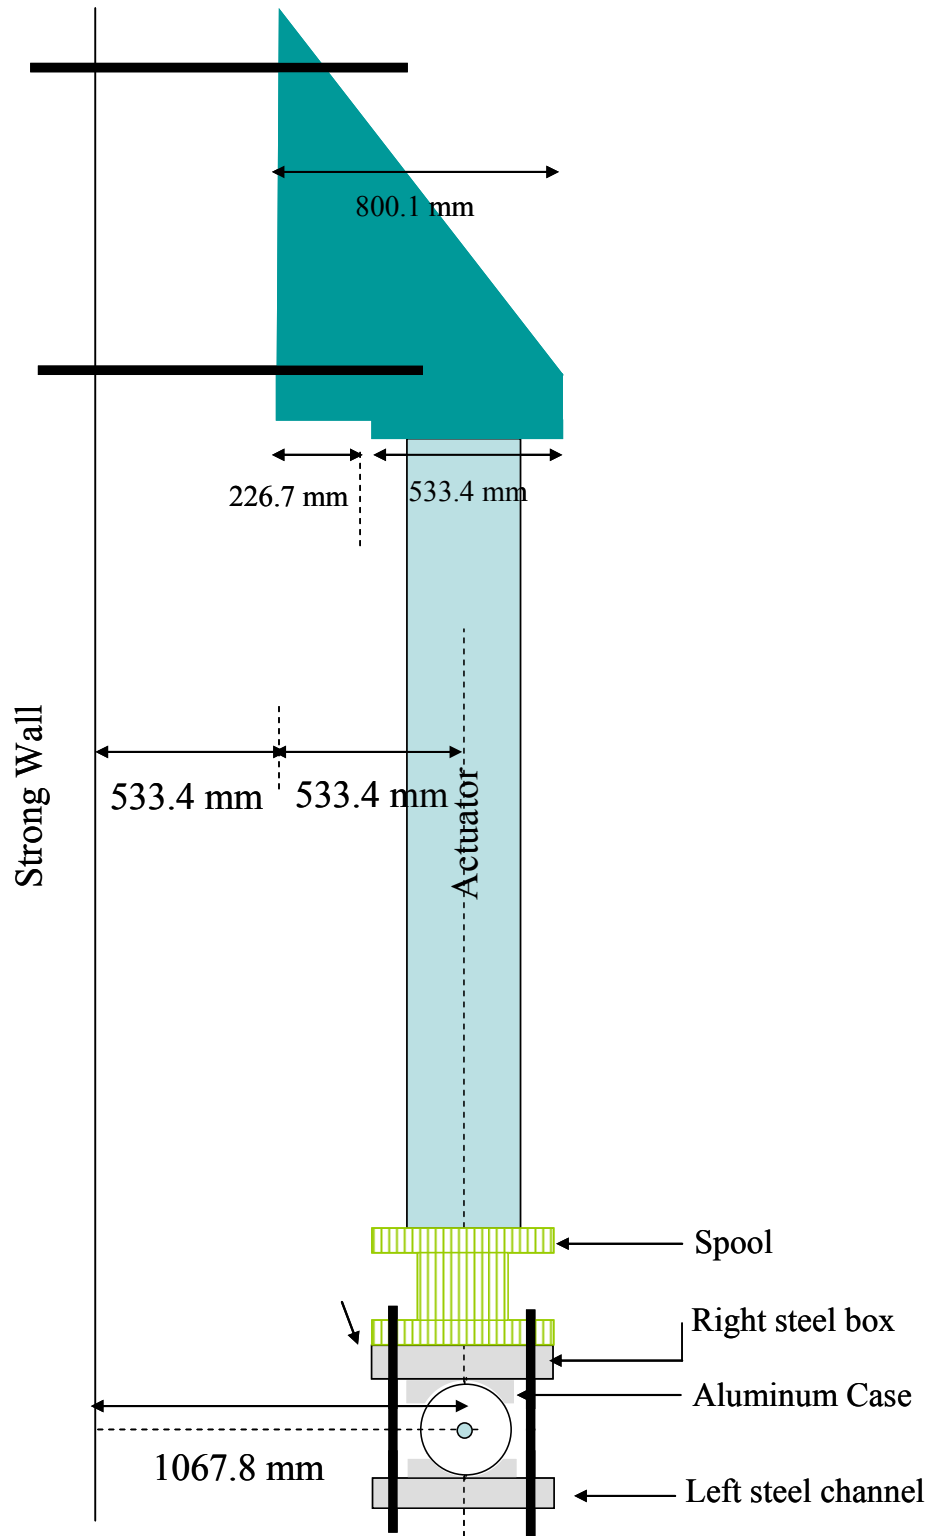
Top view of the column testing set-up with details of fixture plates.
